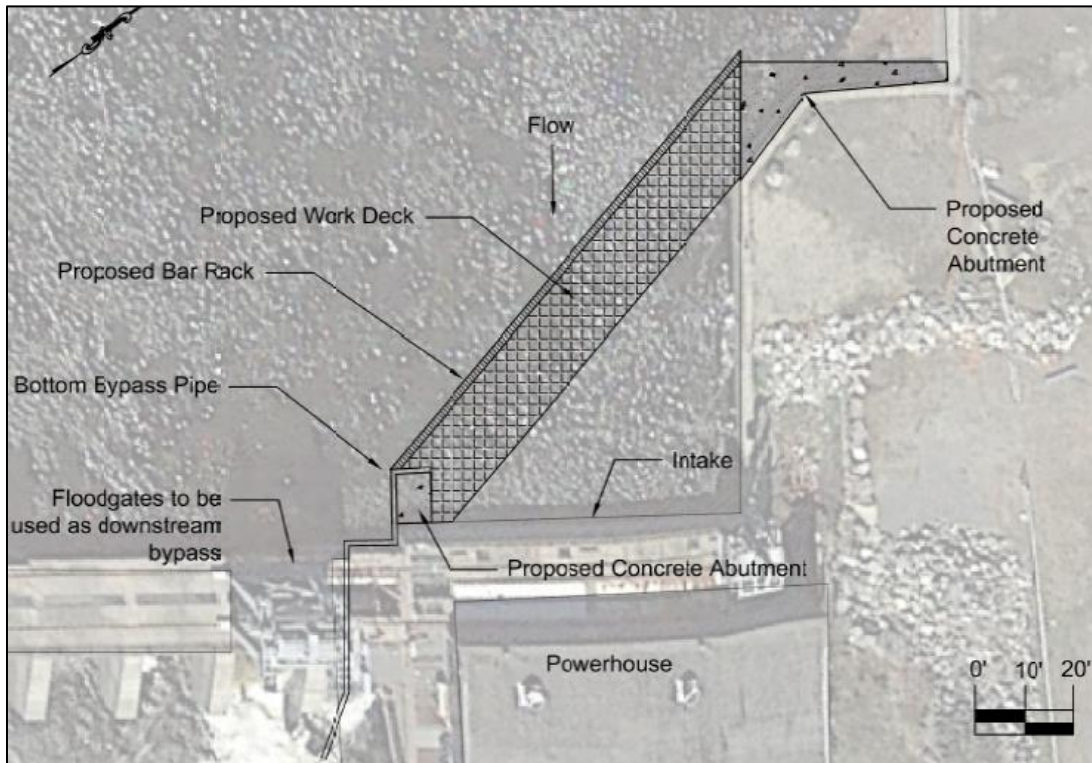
Conceptual design of an angled bar rack installed at Worumbo (plan view).
